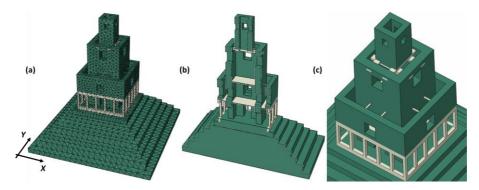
The developed 3D numerical model: (a) meshing, (b) cross-section of the model, and (c) detail of the model of the upper structure. Brickwork with mud mortar is shown with green colour and timber elements in grey colour.
